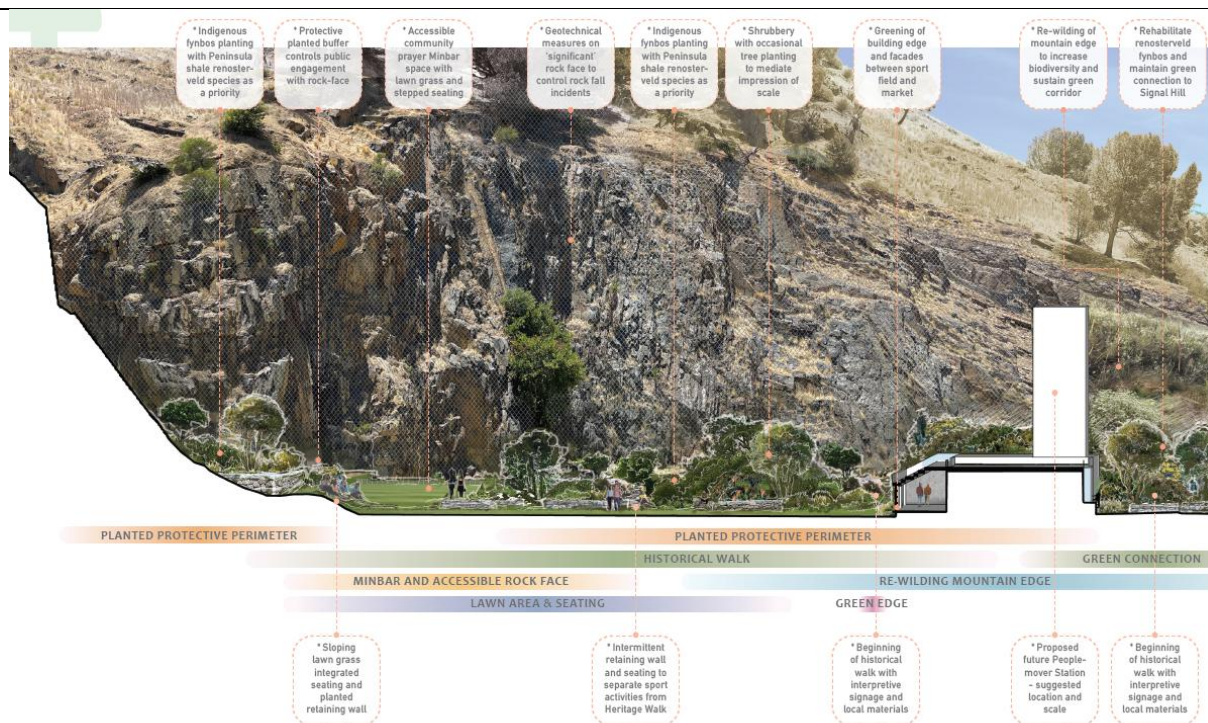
Transverse section 1, dissecting Strand Street Quarry on the east-west axis, indicating the Heritage Walk with perimeter planting, hard and soft seating, the accessible Minbar, geotechnical rock face solutions and proposed facilities
